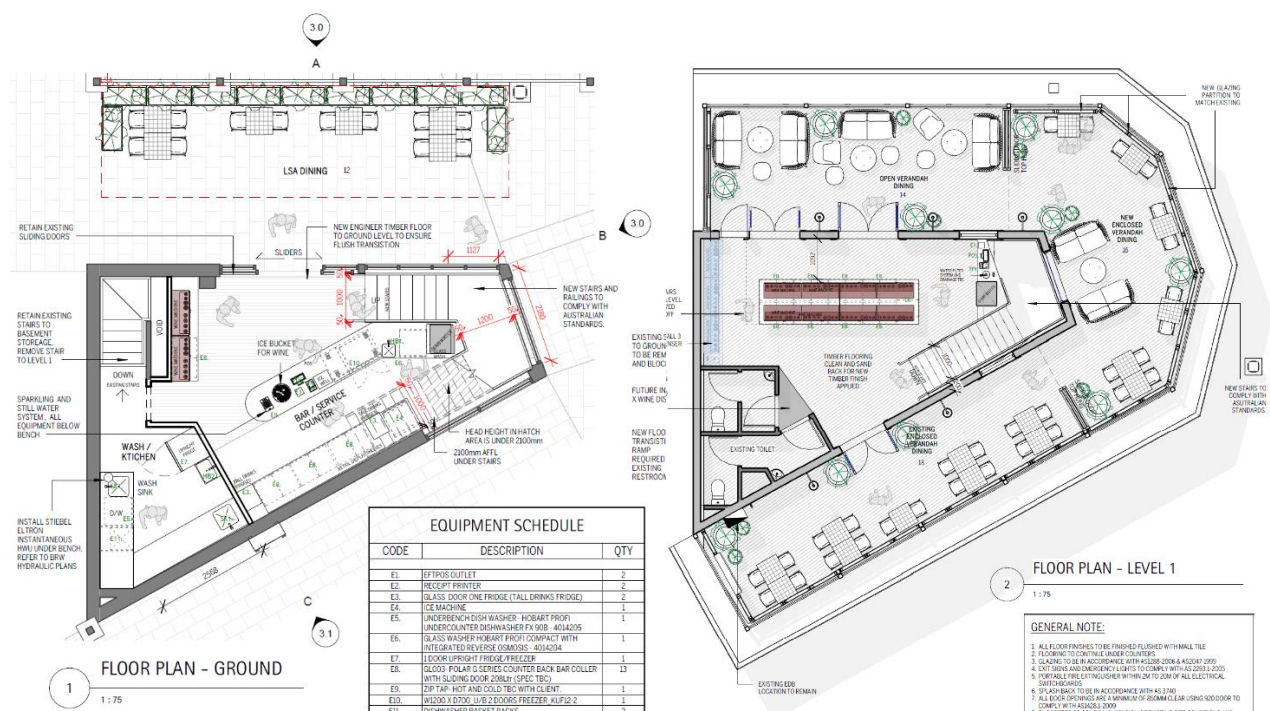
Proposed site floor plan – Source: Stickybeak Win and Bar
